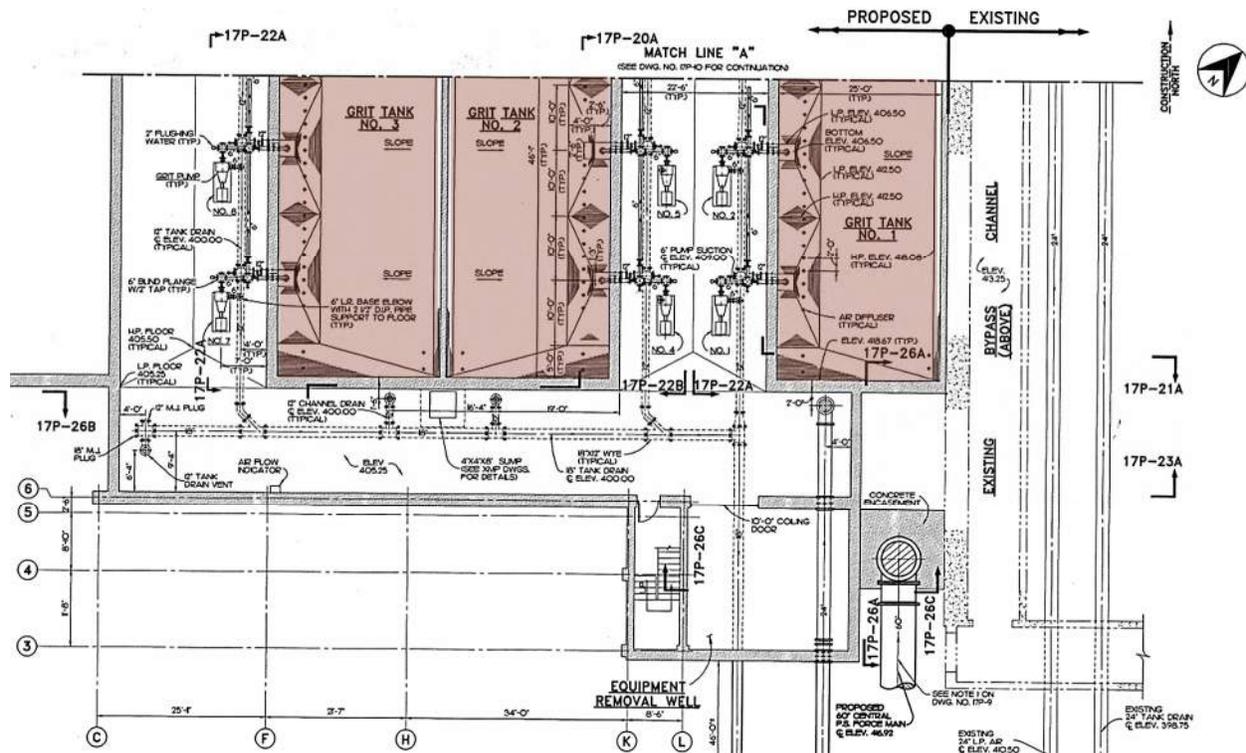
Plan Drawing of Existing Aerated Grit Chambers
